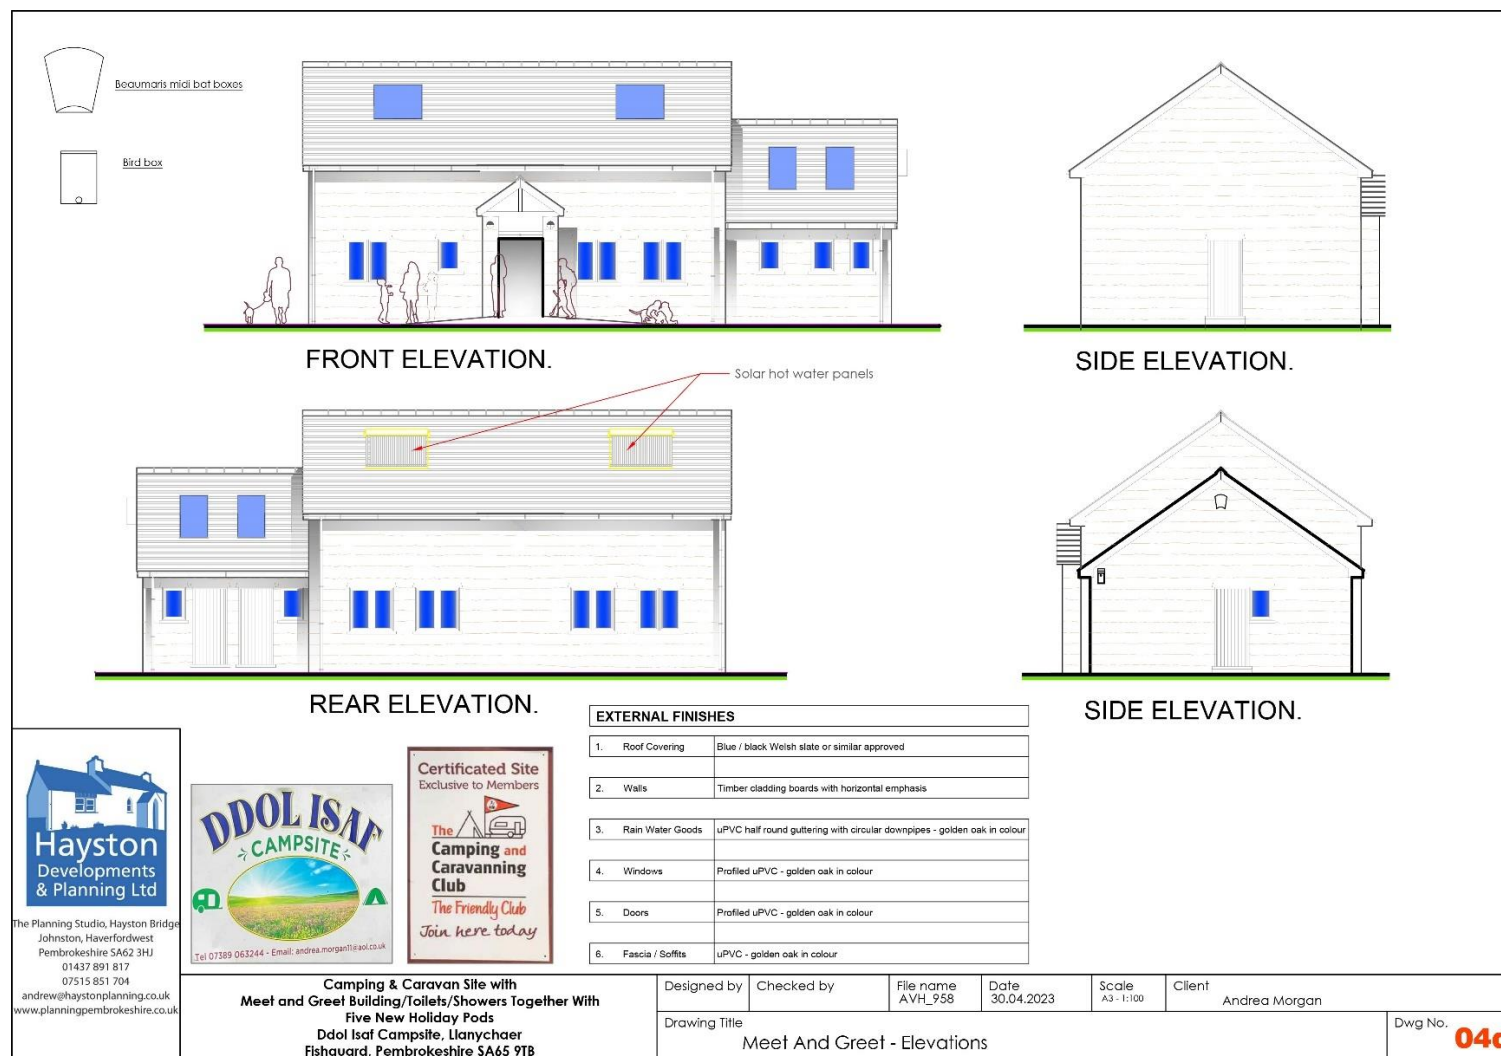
Proposed design details for the meet and greet building. Plan provided by the client, not reproduced to scale.
